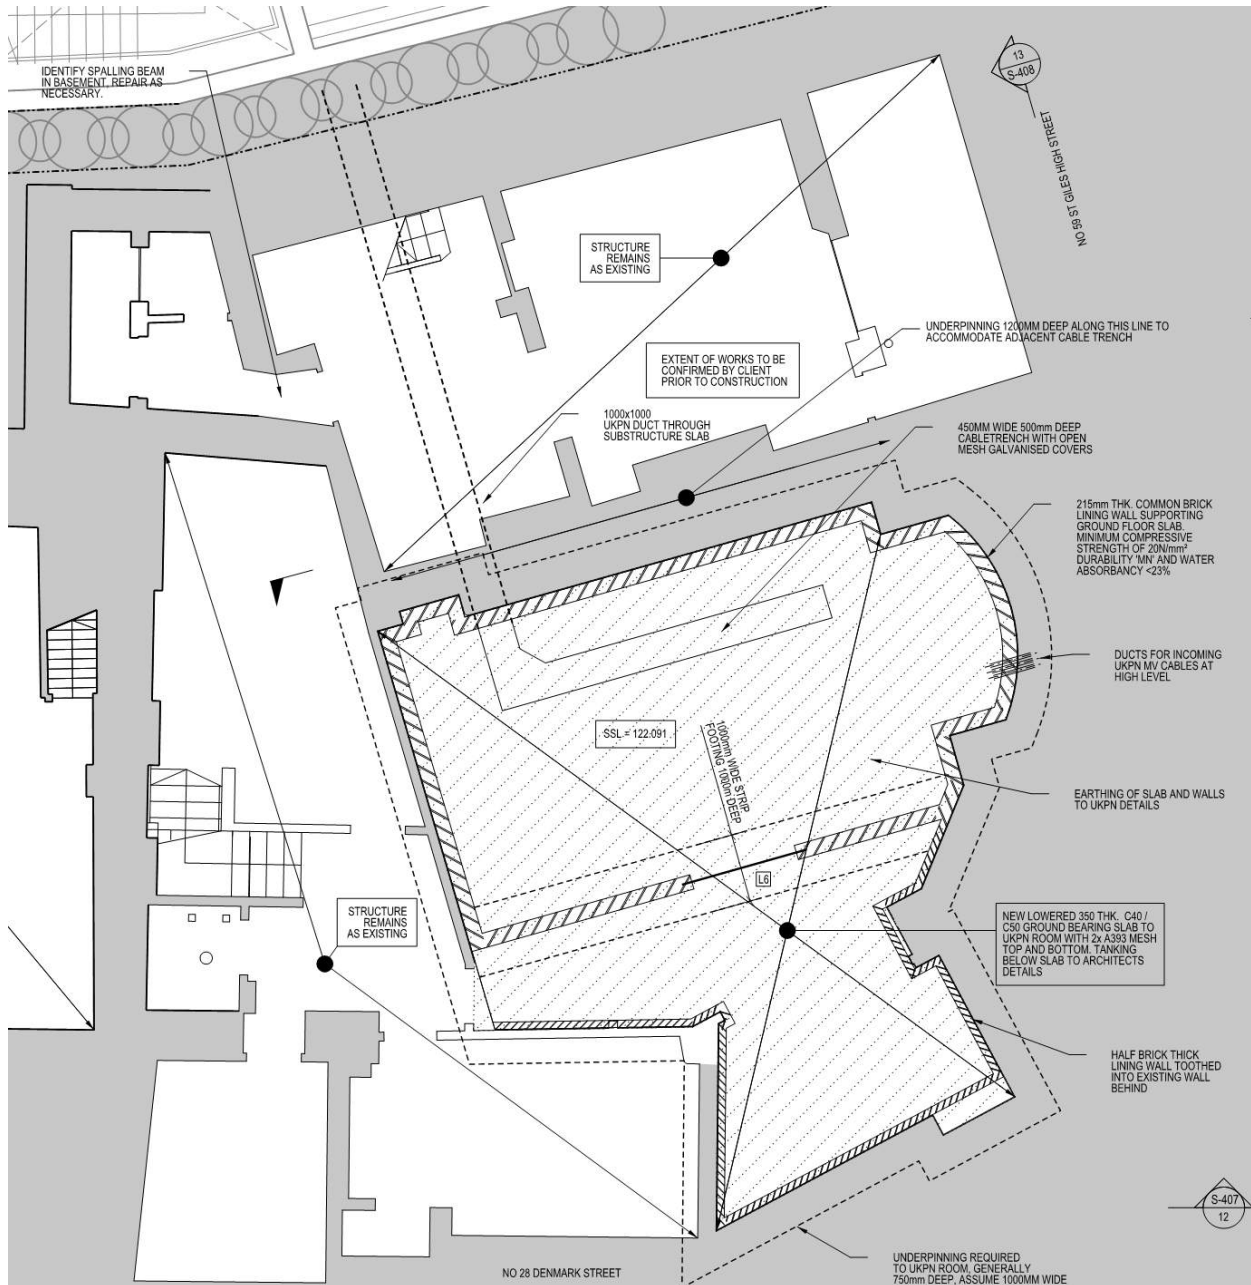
Rebuilt basement slab at 28 Denmark Street for incoming UKPN switch room.
